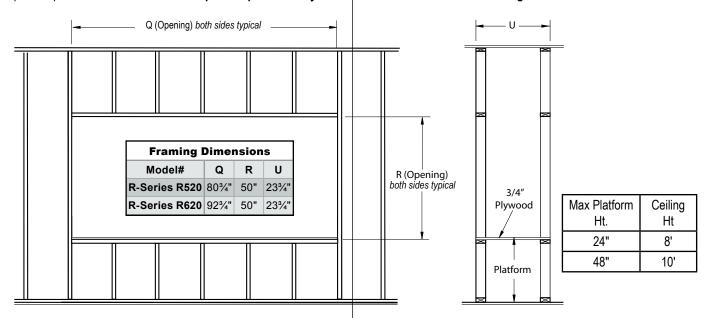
Fireplace installation, (Rough Frame-In dimensions) Both Sides are Typical.
